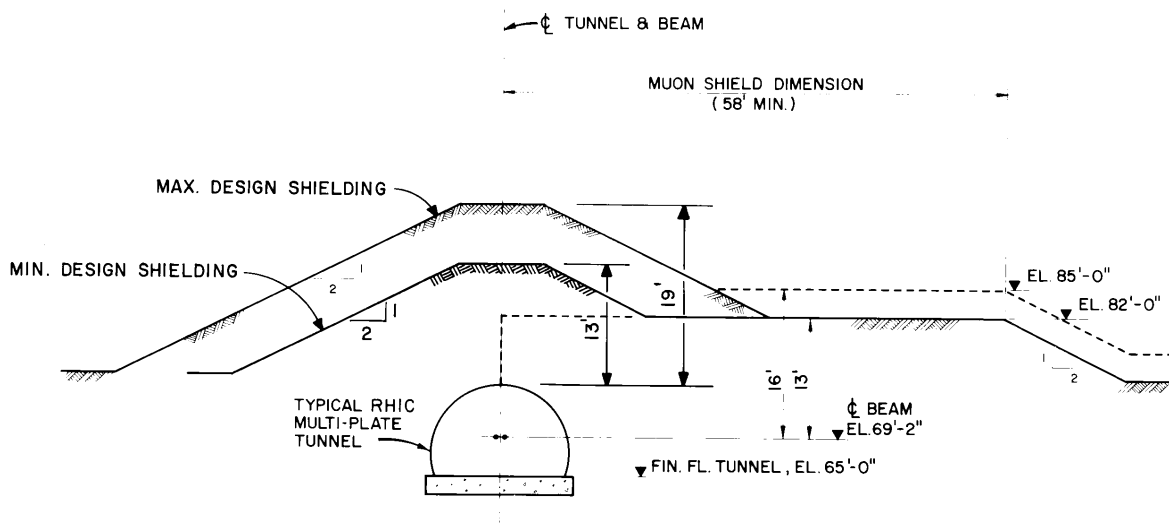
Typical section through RHIC tunnel showing maximum and minimum earth cover.
